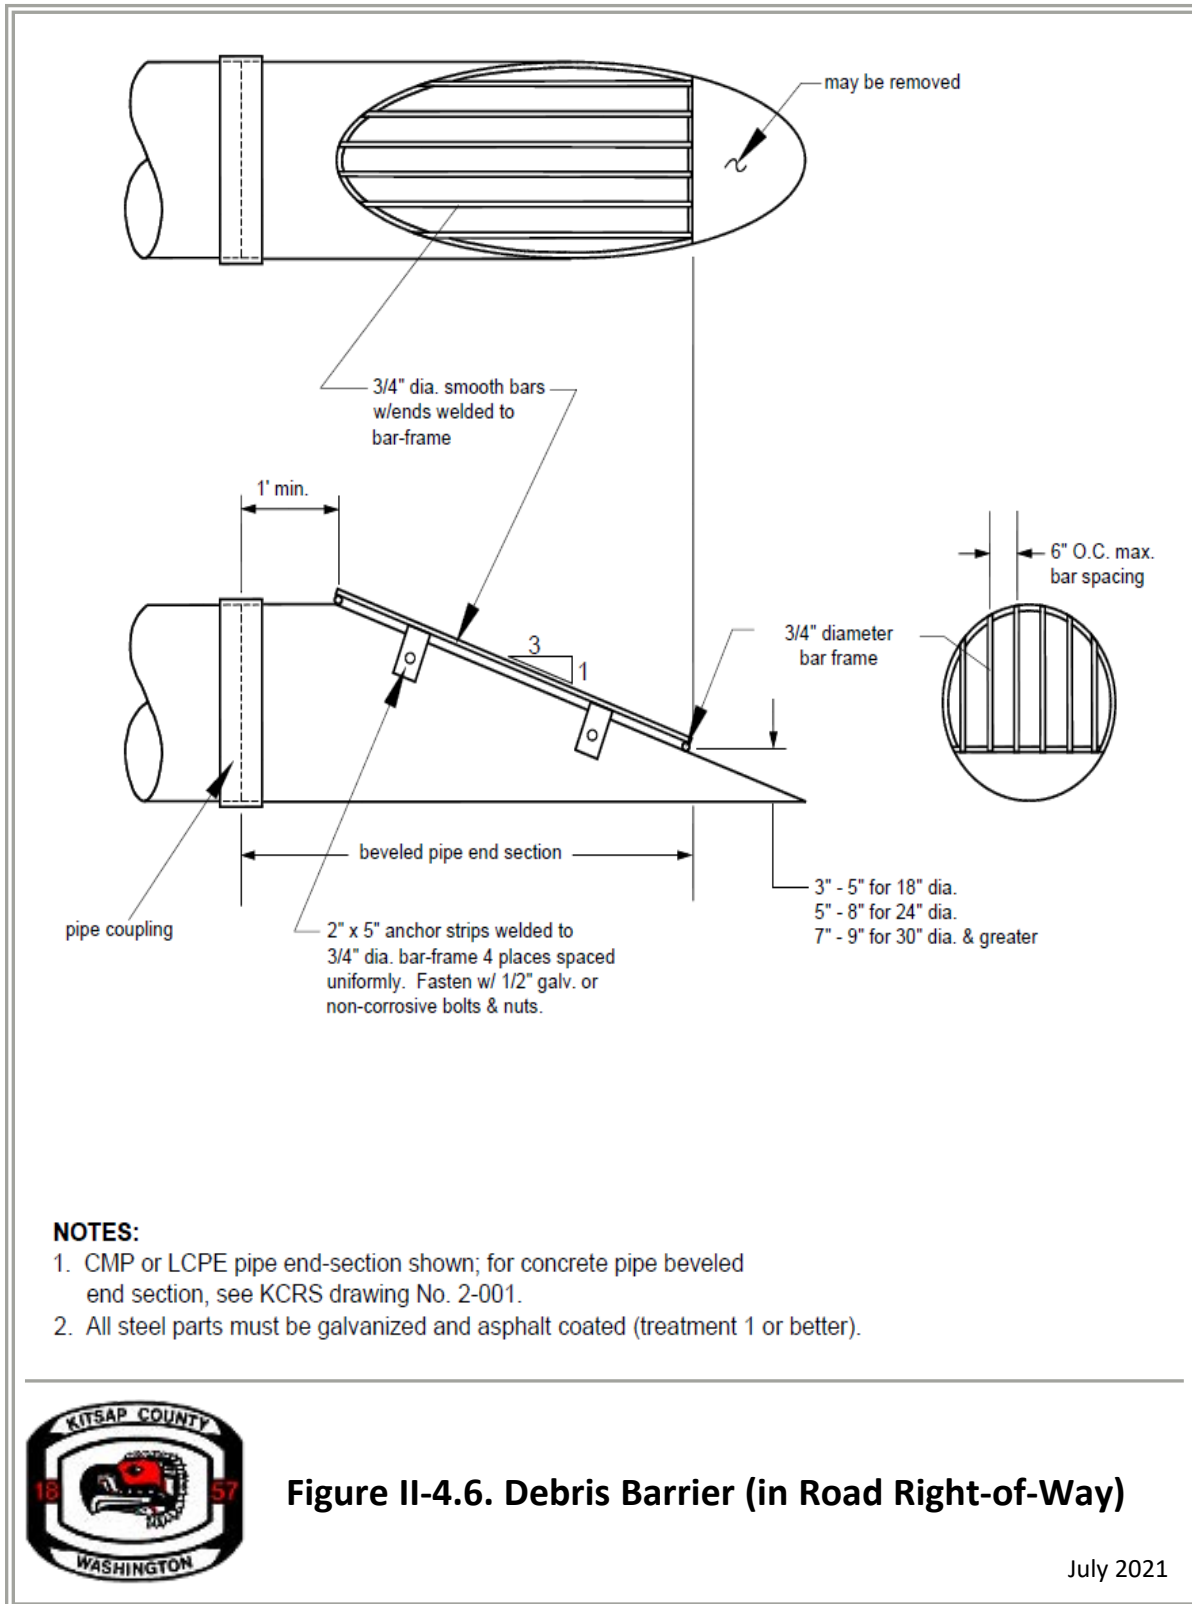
Debris Barrier (in Road Right-of-Way)
